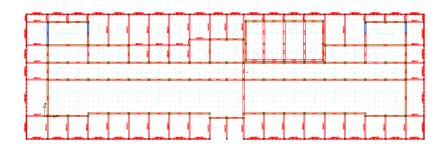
CDs WIN 3D model typical floor plan | Version 1
